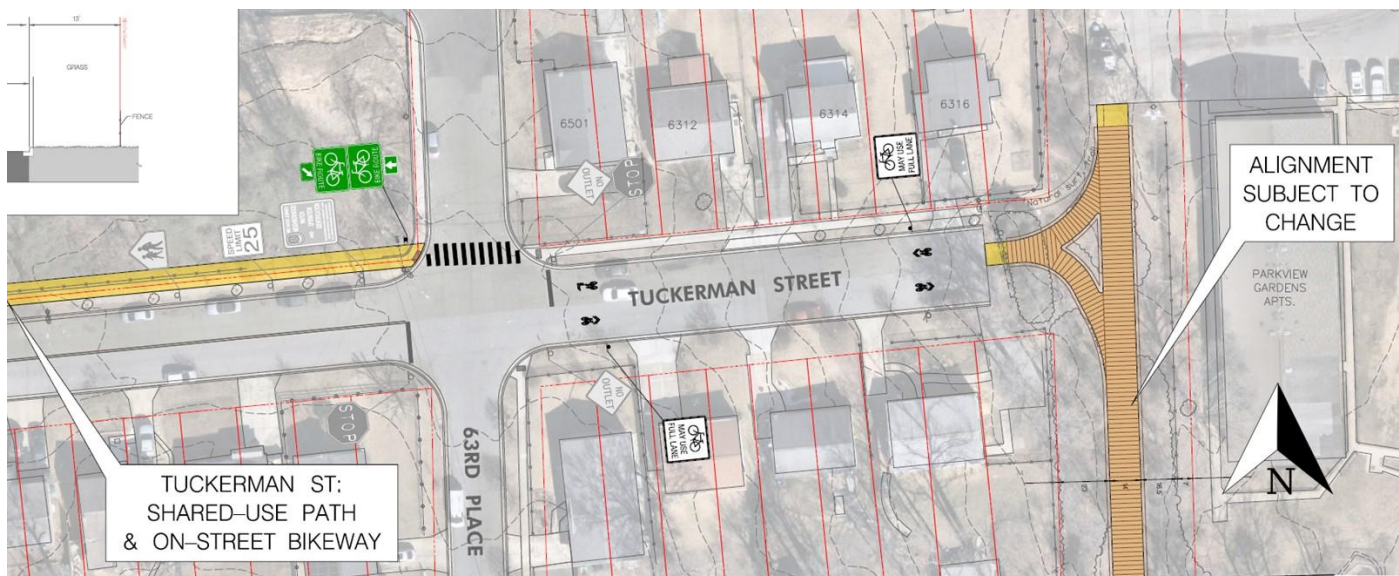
Proposed bike facility transition from Tuckerman St shared use path to 64th Ave boardwalk and connection to Parkview Garden apartments.
